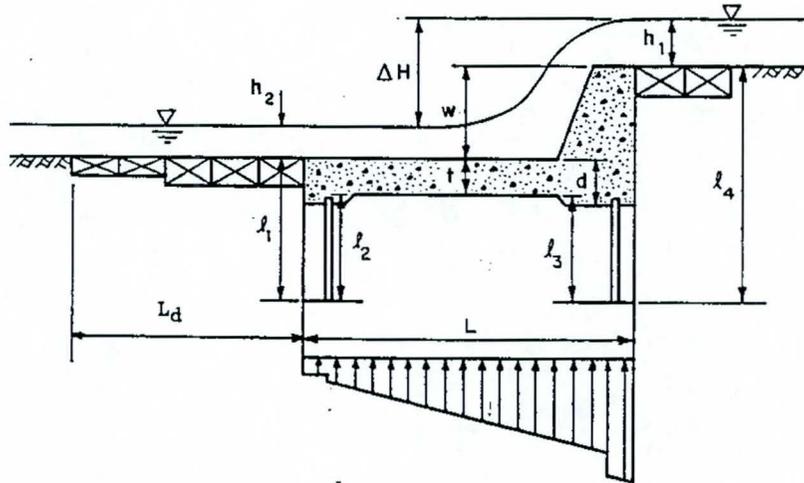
Definition sketch of typical Japanese low-head drop structure.
